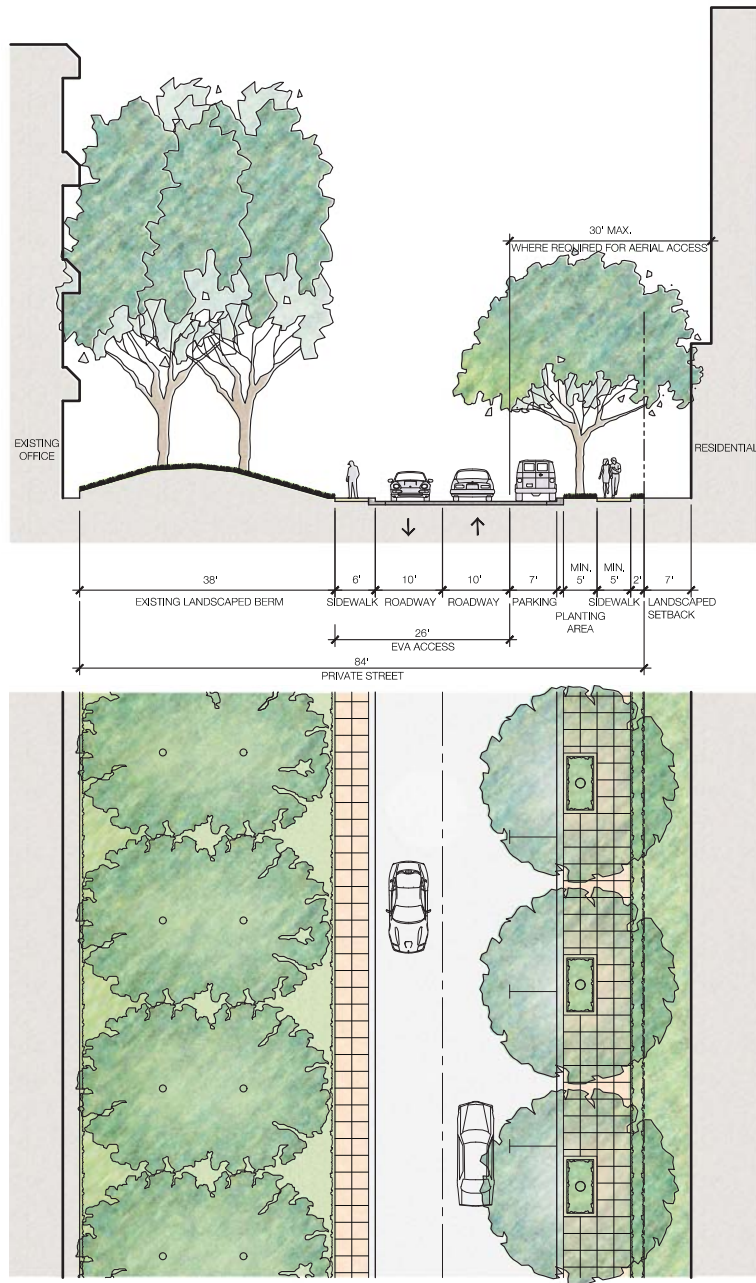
Residential Adjacent to 2600 Office Building
